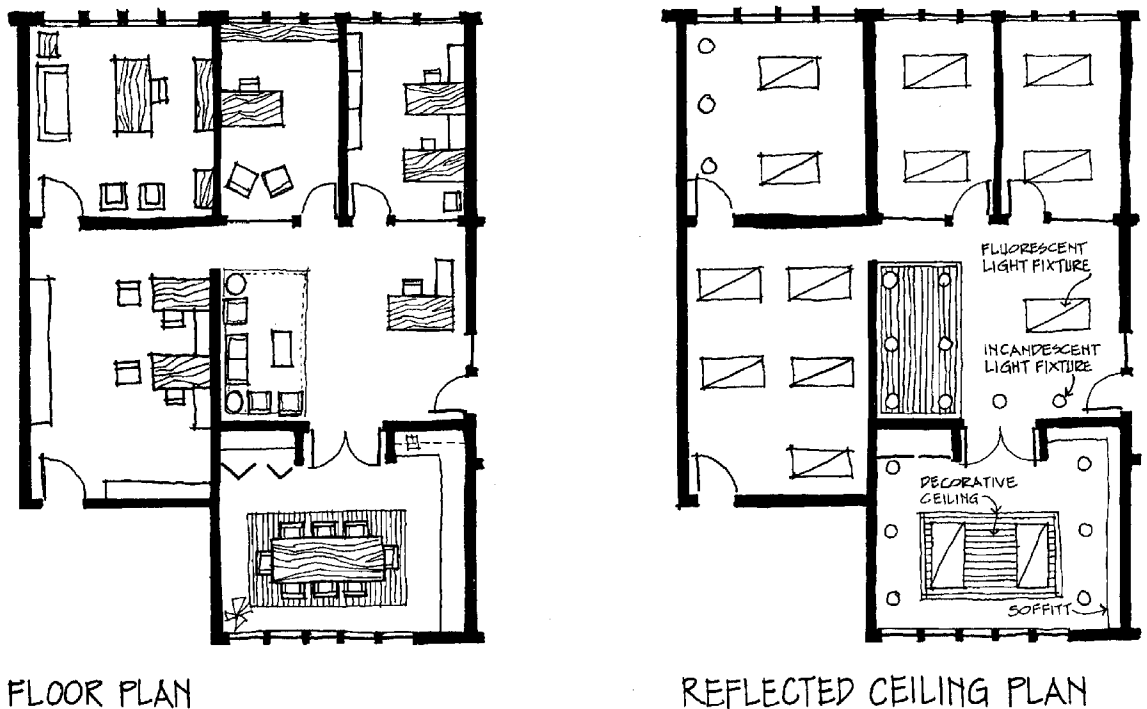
A reflected ceiling plan must be oriented to the floor plan view.
